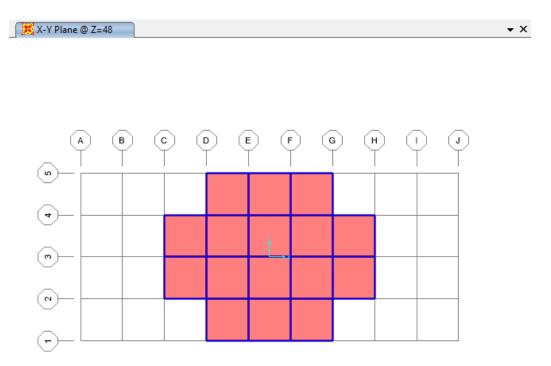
(b) plan of setback model 2(rectangular type) beyond 45m height
